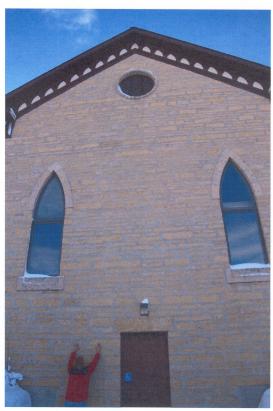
Engelstad outside the new narthex at the lower level of the north wall.
